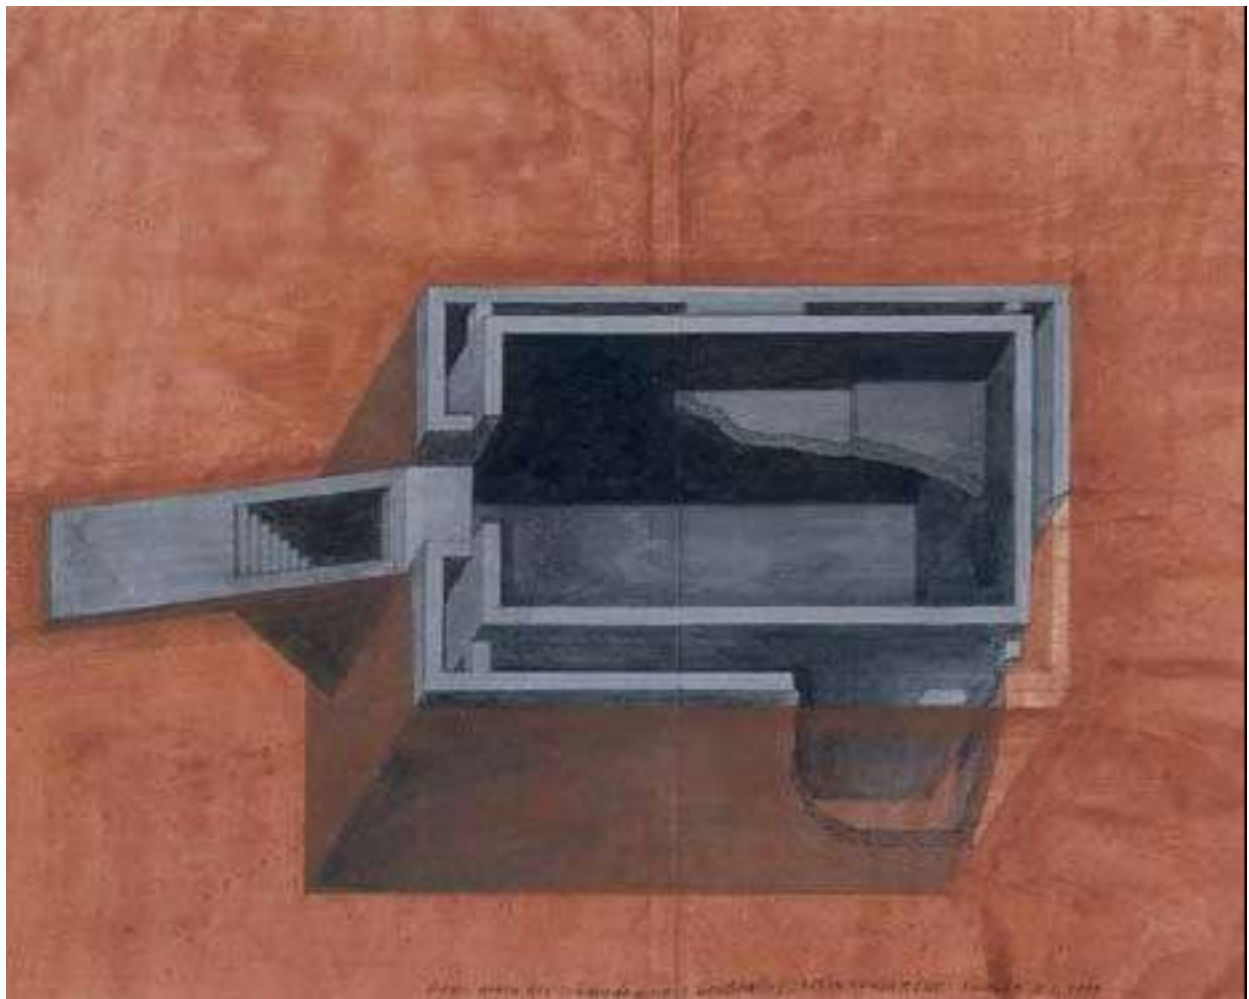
Drawing of concrete foundations (Walter Pichler, 1999-2002)
